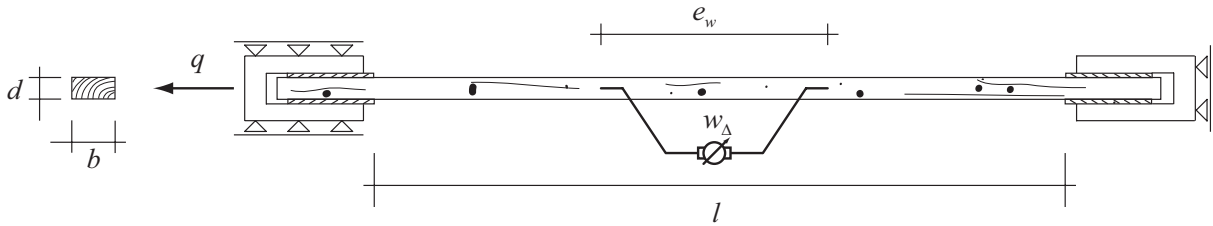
Typical tension test configuration; l , b , d , e_w are the specified dimensions, q and w_Δ are the measurements.
